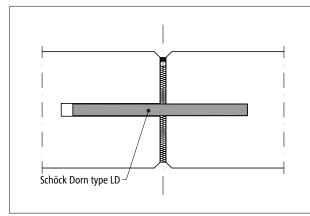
Schöck Dorn: Expansion joint formation in in-situ concrete
